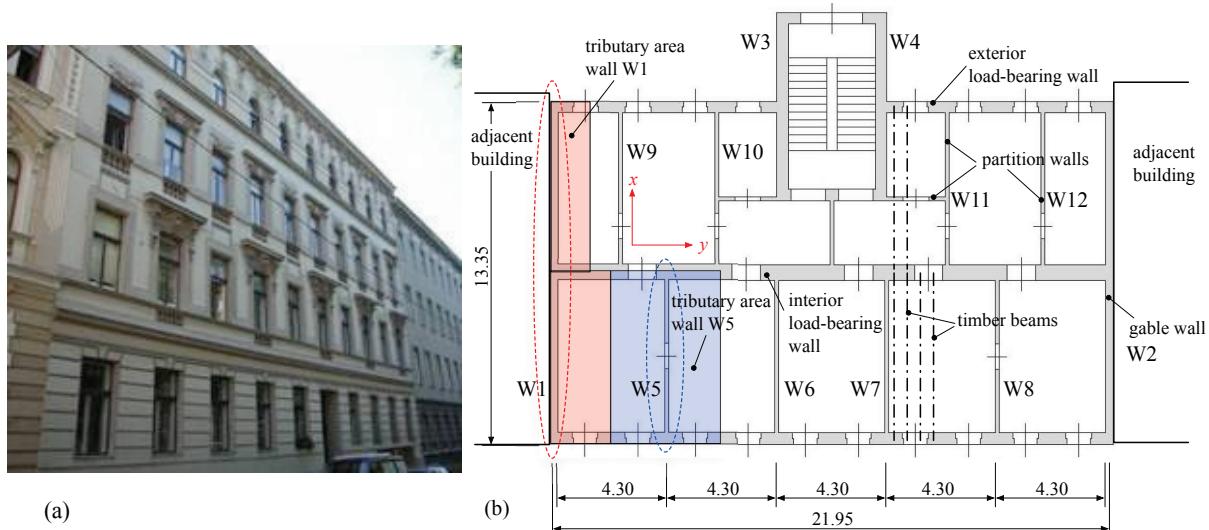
Representative Viennese brick-masonry building. (a) Façade. (b) Floor plan (Bauer et al. 2010)
